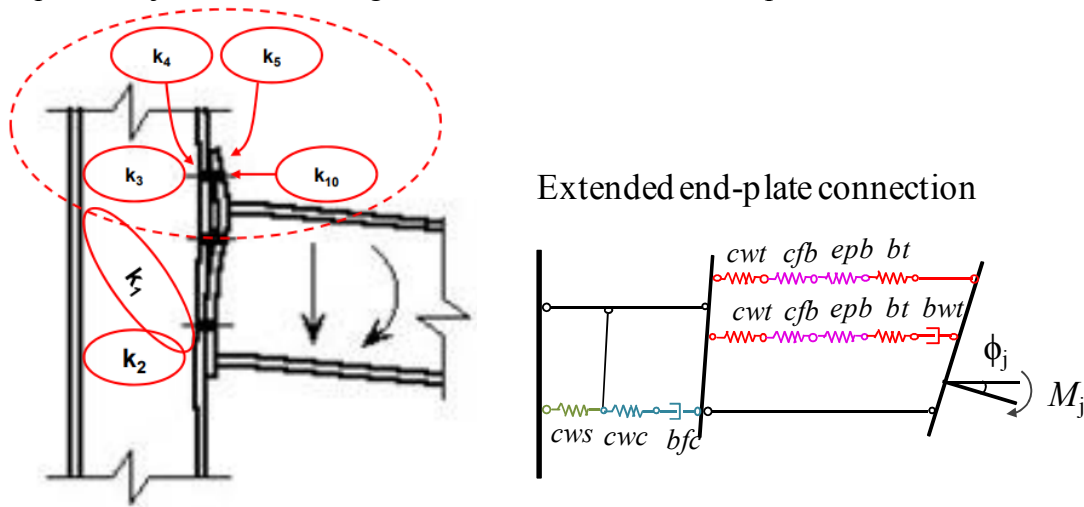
Example of a finite-element model of a beam column joint ([5]).
